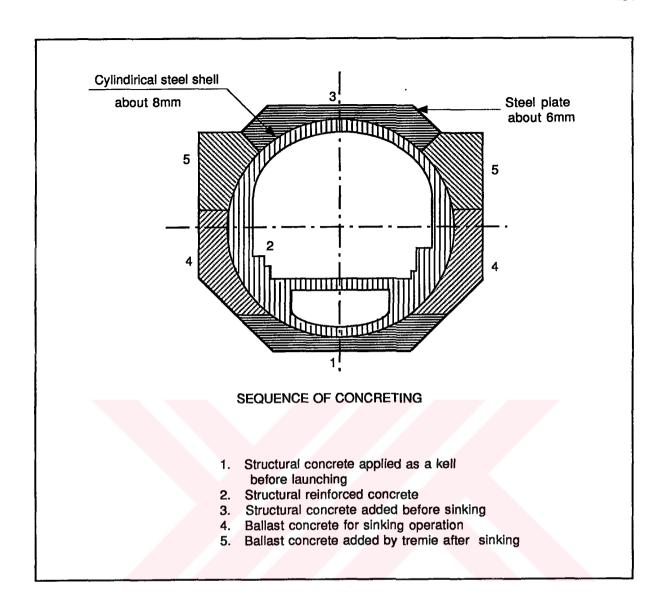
TYPICAL CROSS SECTION OF A STEEL TUNNEL
